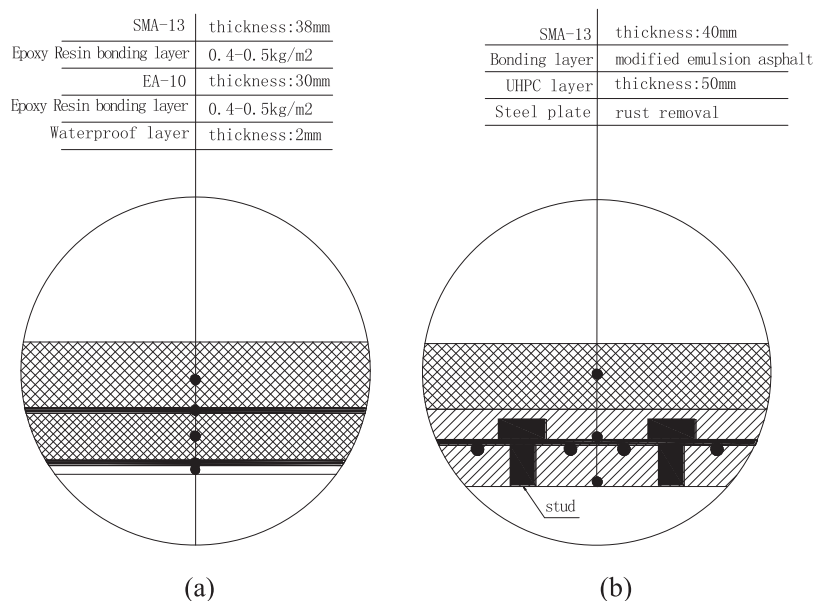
Deck pavement detail construction of Rong Jiang bridge.
